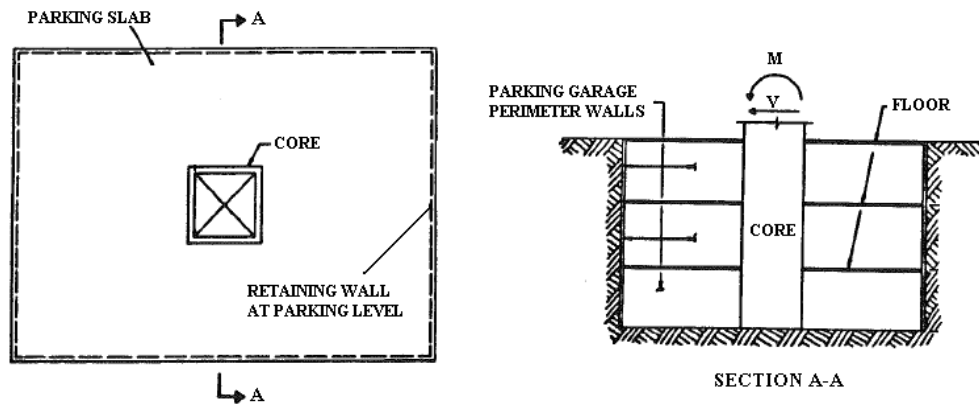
Plan and elevation section of the subgrade structure which include core wall, perimeter walls and parking slabs (from Bevan-Pritchard, Man and Anderson 1983).
